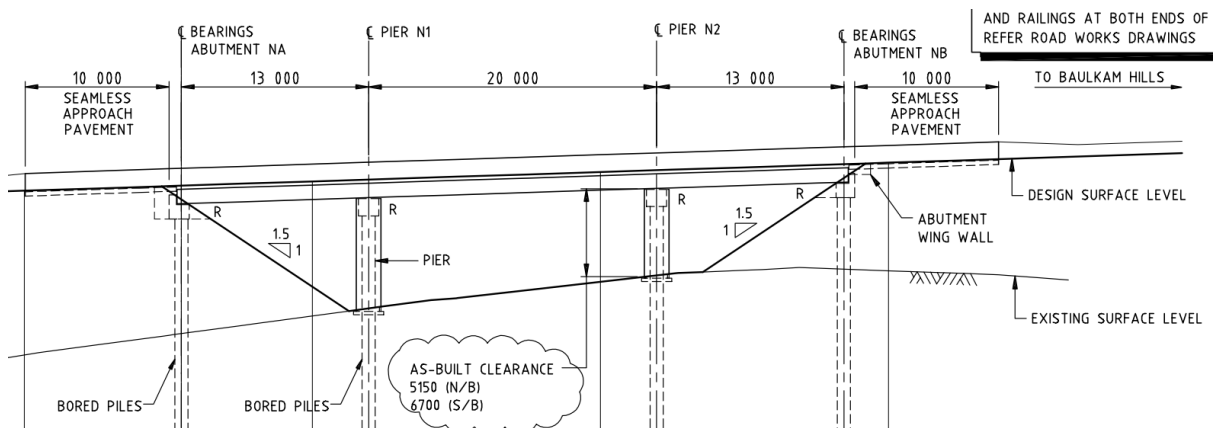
Typical Elevation – Existing Super-T Girder Bridges with Spill-Through abutments
